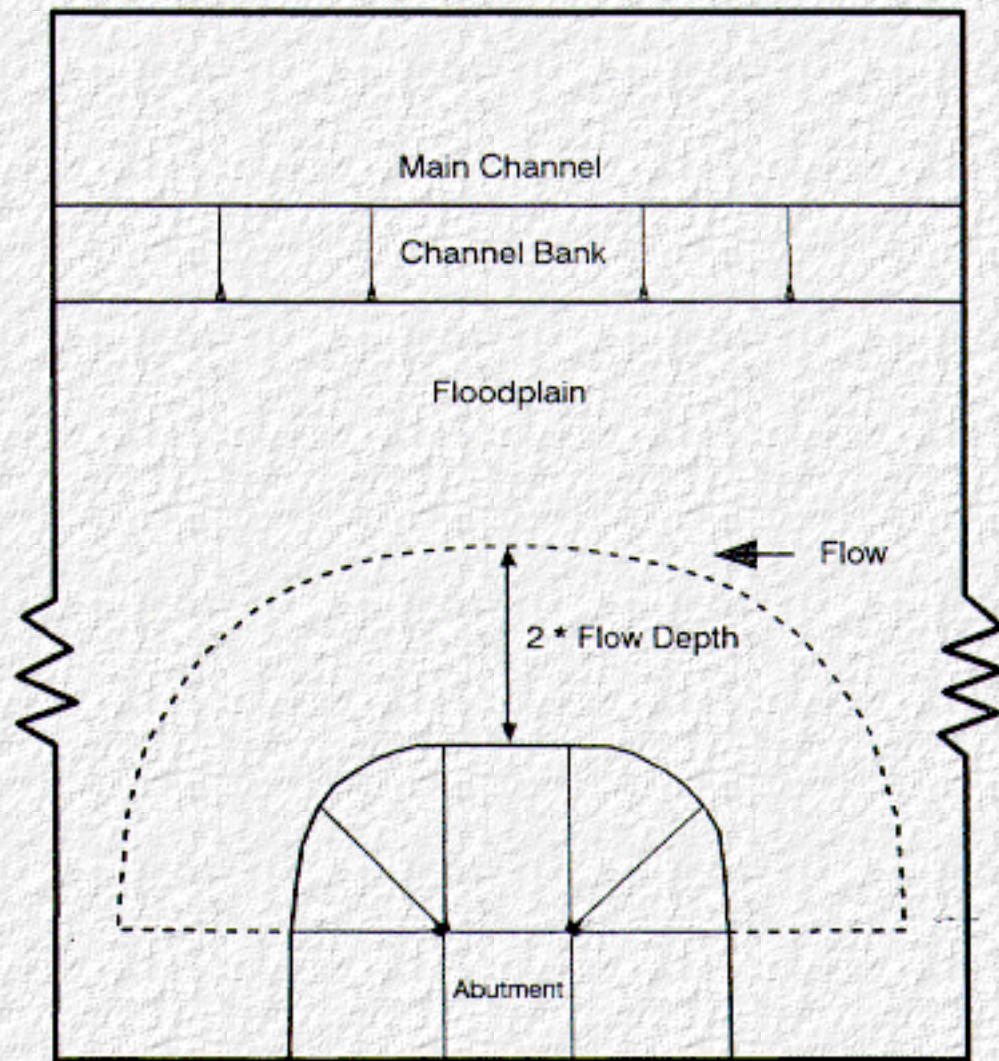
Plan View of the Extension of Rock Riprap Apron ⁽⁸³⁾
